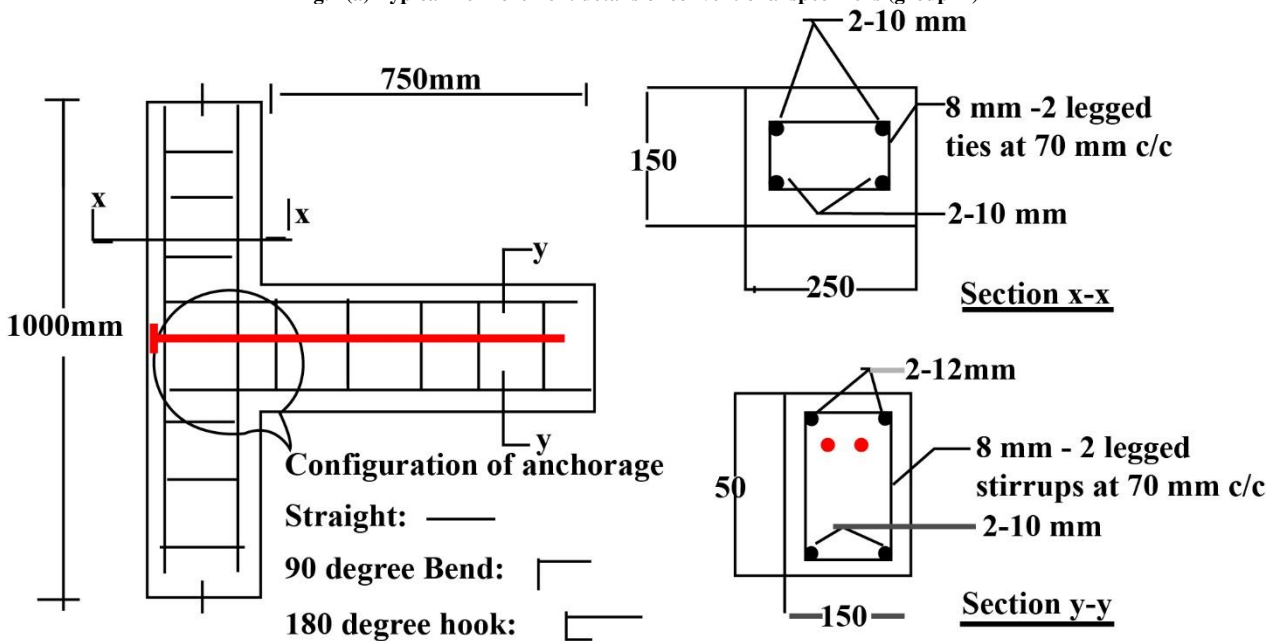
(b) Typical Reinforcement details of Retrofitted specimens (group-B)
